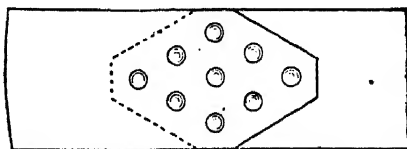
Plan of Strongest Form of Lap Riveted Joint.
